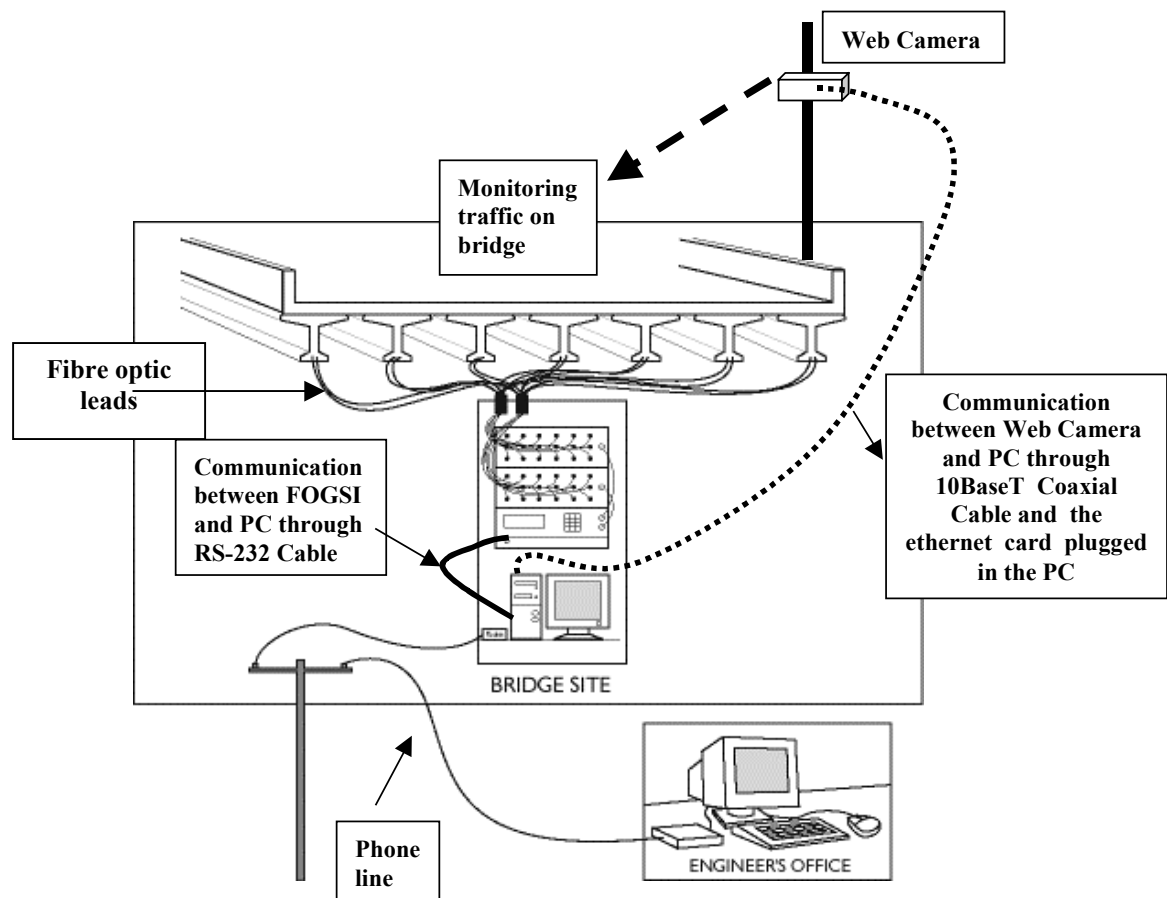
Layout of monitoring systems in Taylor Bridge
